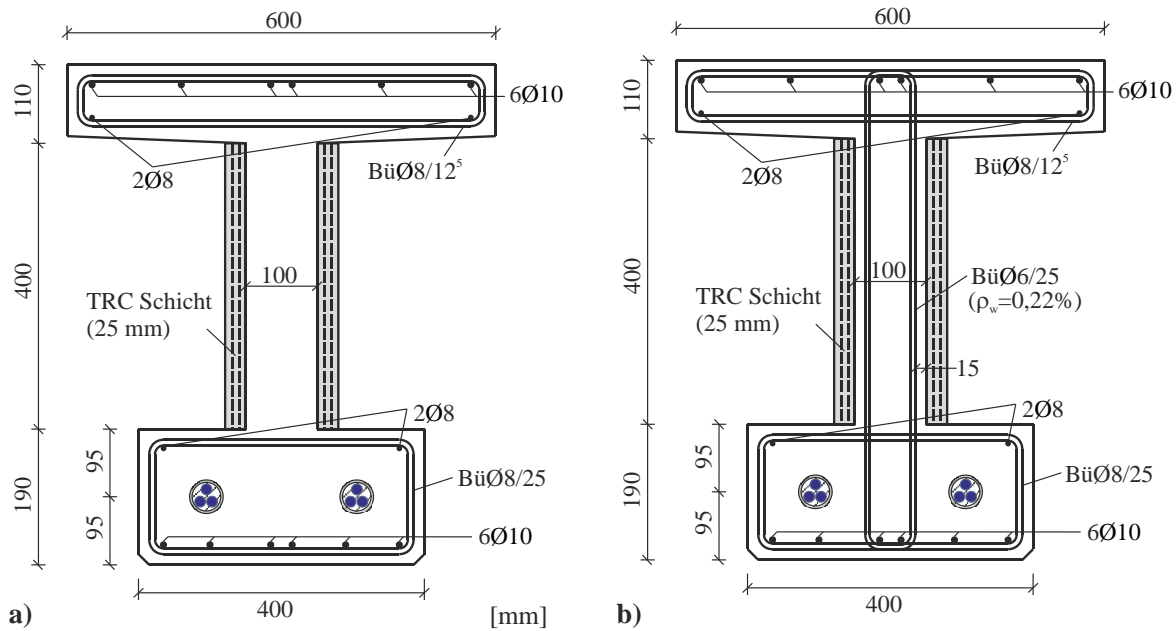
a and b: Beam cross-sections, dimensions in mm, 1 mm ~ 0.039"
